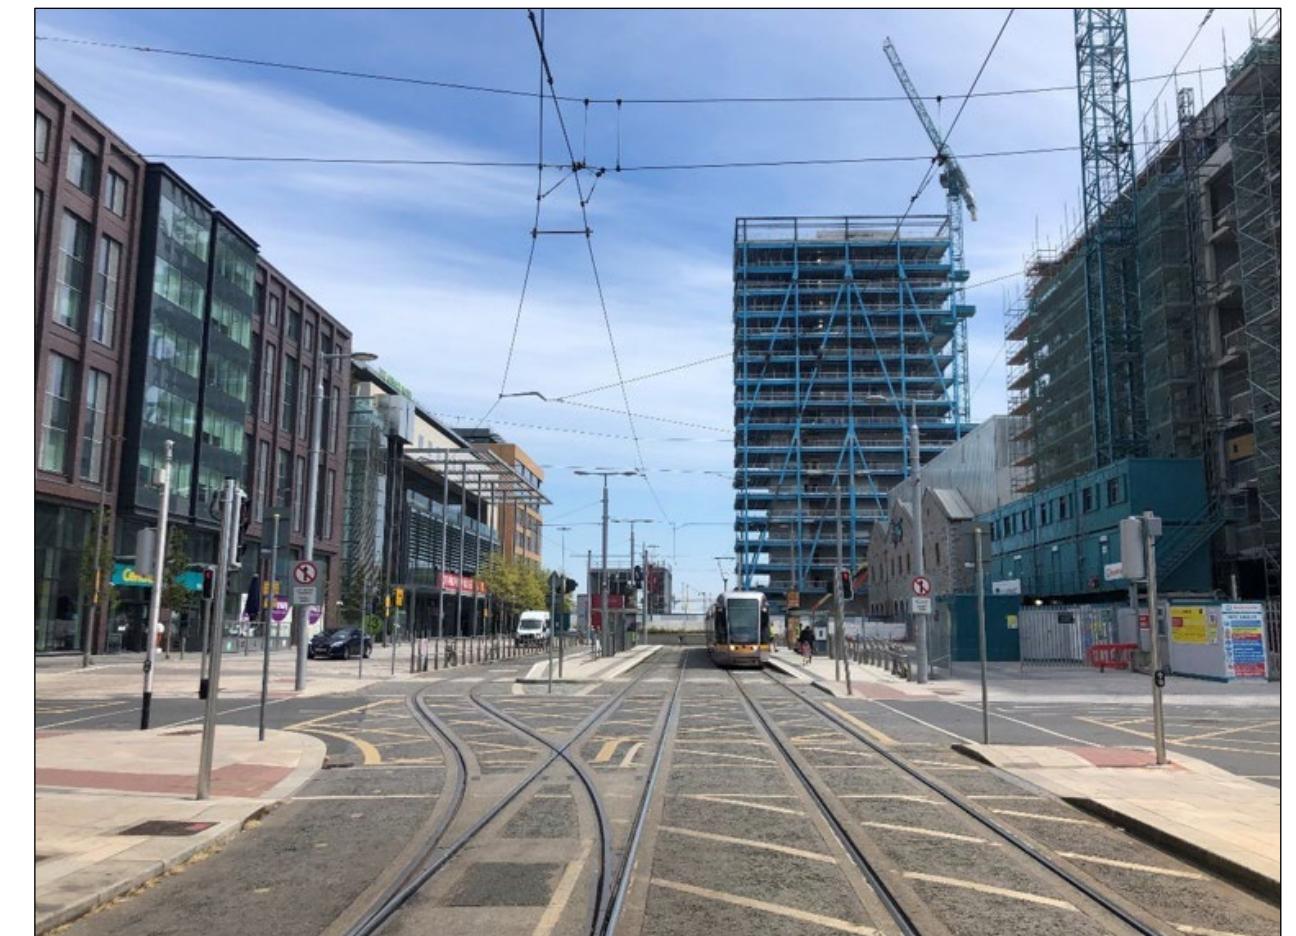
The view from Mayor Street Upper looking eastwards to the Exo Building, under construction, with the LUAS stop in the middle ground. Source: TPA, May 2020.
